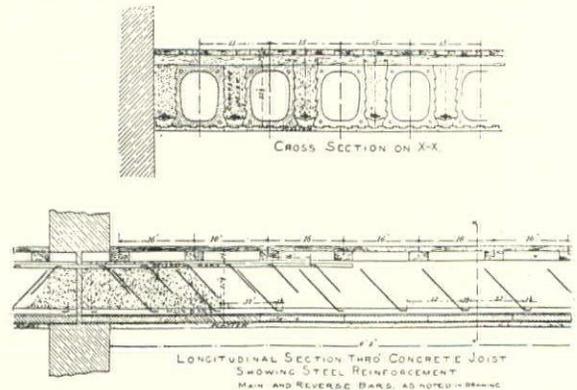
FLOOR OF REINFORCED-CONCRETE WITH HOLLOW-TILE SEPARATORS, FLAT CONSTRUCTION, KAHN SYSTEM.
